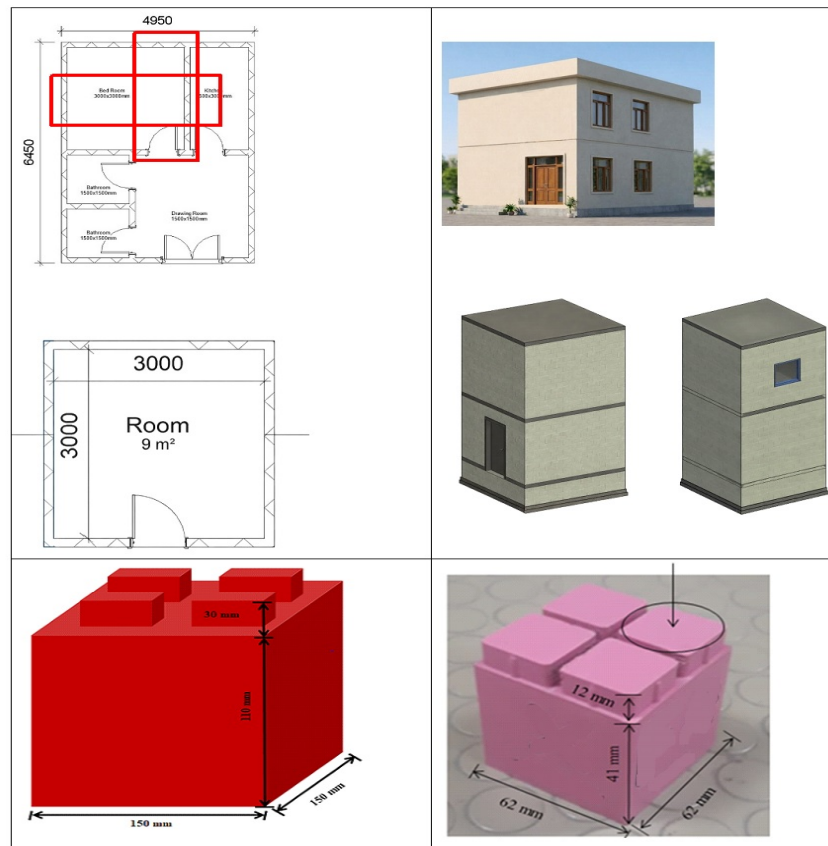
Proposed mortar free interlocking plastic block house: a) GF & FF plan, b) 3D Isolated View c) Enlarged bedroom plan, d) Front and side 3D view of Bedroom e) Back and side 3D view of Bedroom & f) Real plastic block Khan [1].
